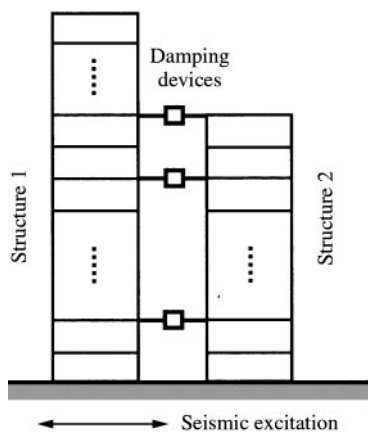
A pair of adjacent buildings interconnected by hysteretic dampers.
